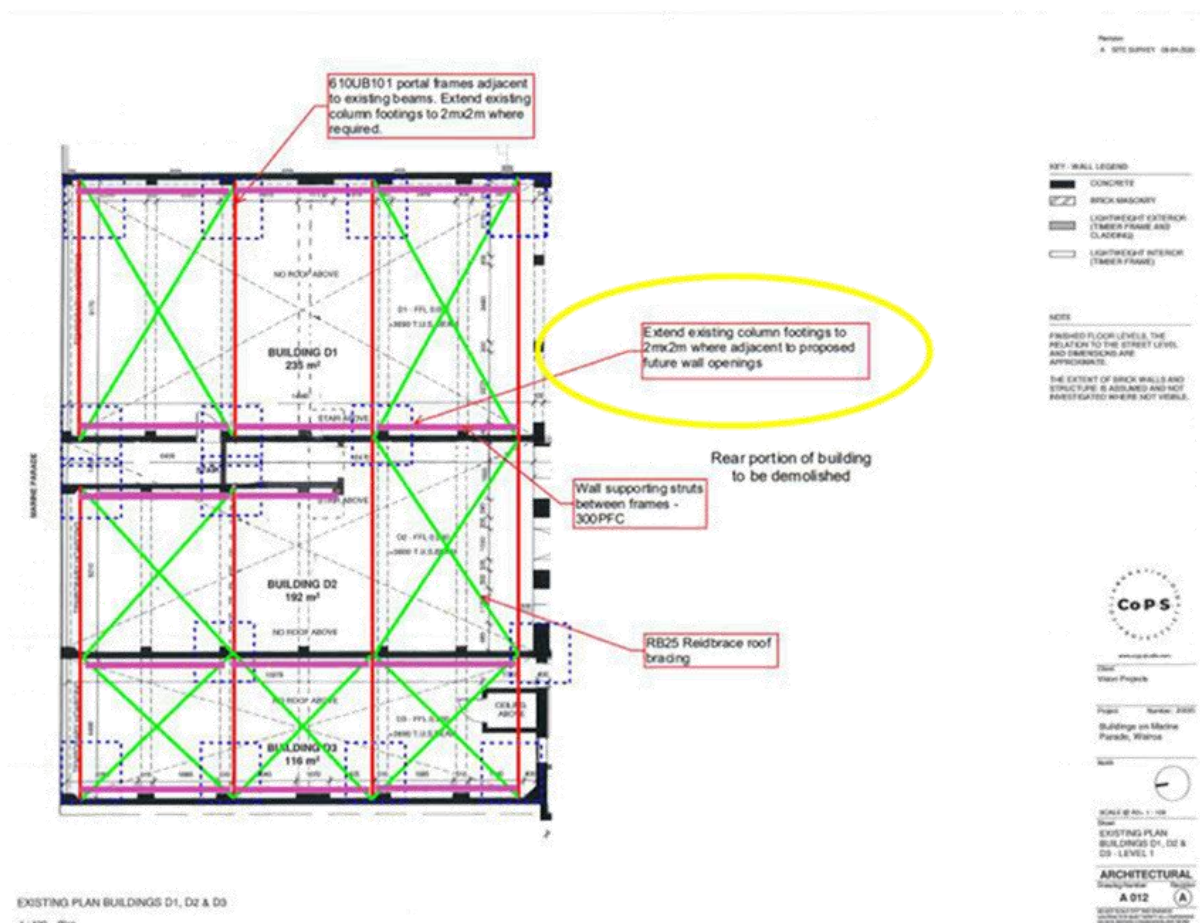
Existing plan with sketches imposed on it showing methods of strengthening building remains. Concrete footings information circled in yellow by E Pishief. Source: WSP report
